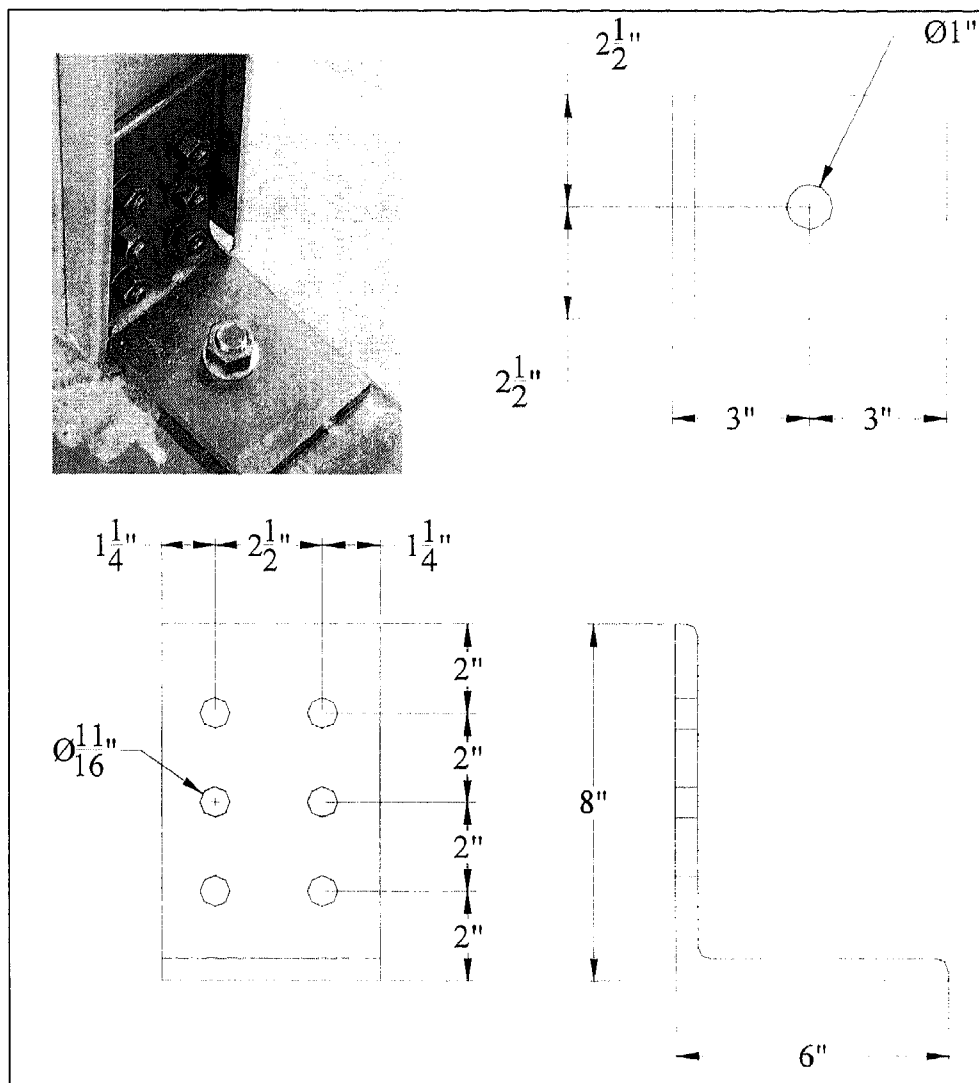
Stud-to-Floor Anchorage using a 1/2-in Thick Steel Angle Connection
